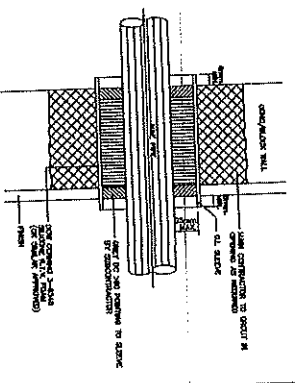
DETAIL - FIRE SLEEVE THROUGH FLOOR SLAB
